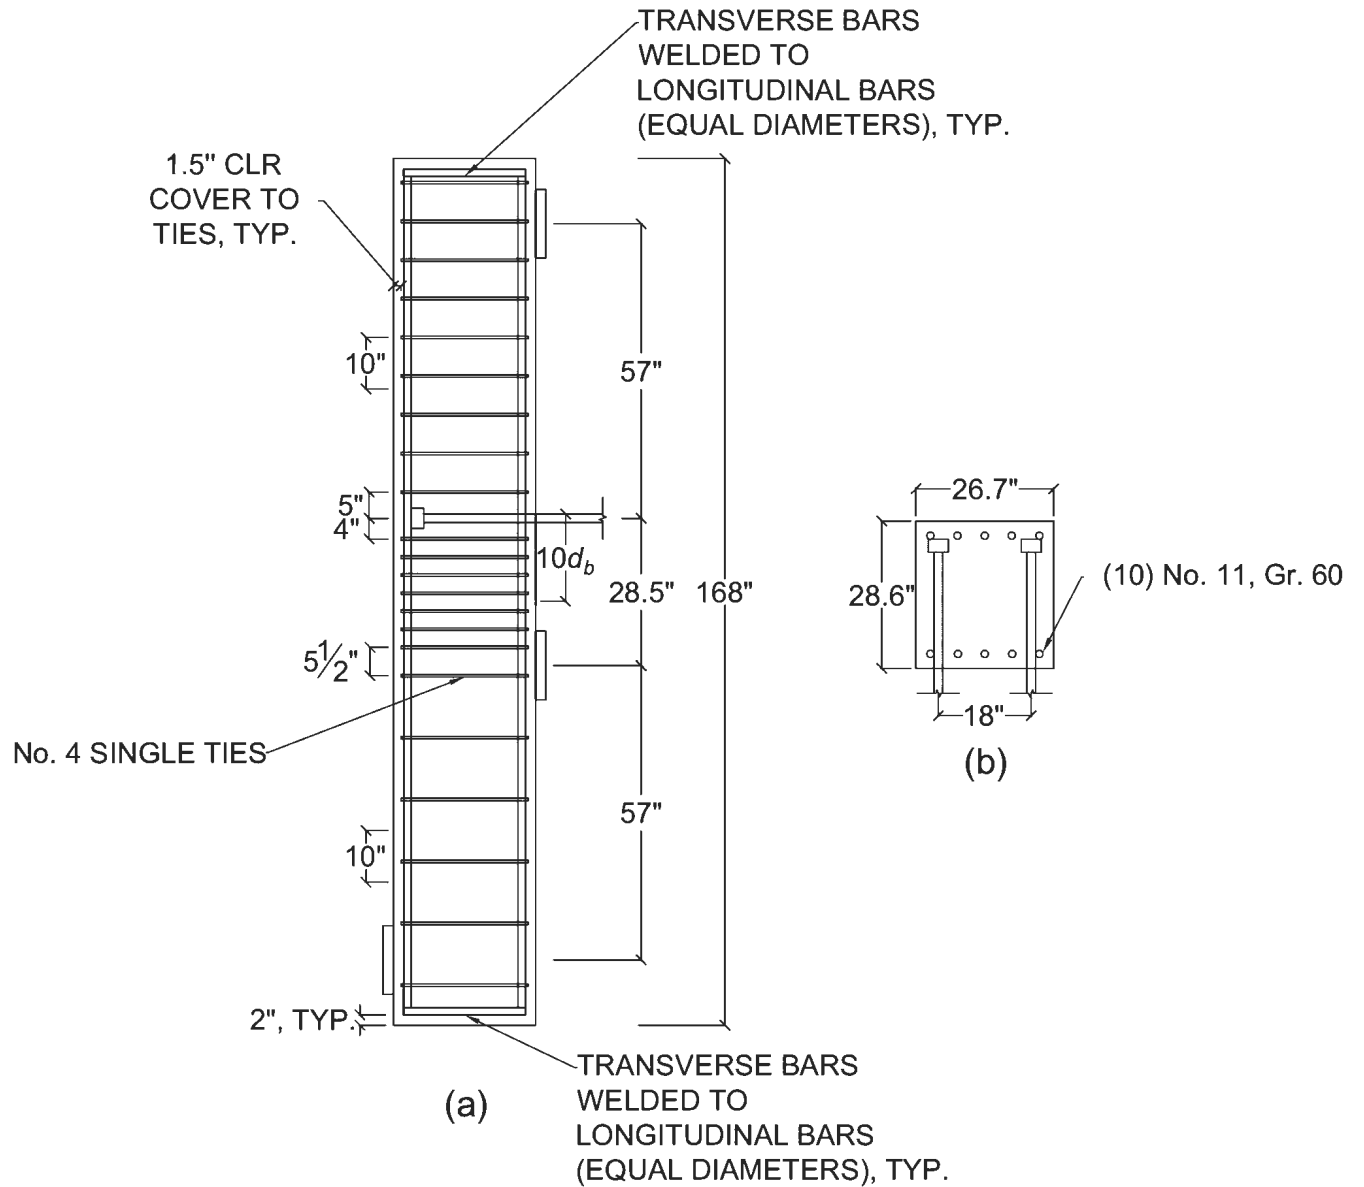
Details of reinforcement layout for No. 14 headed bar specimen 14-16C: (a) elevation, (b) cross-section
